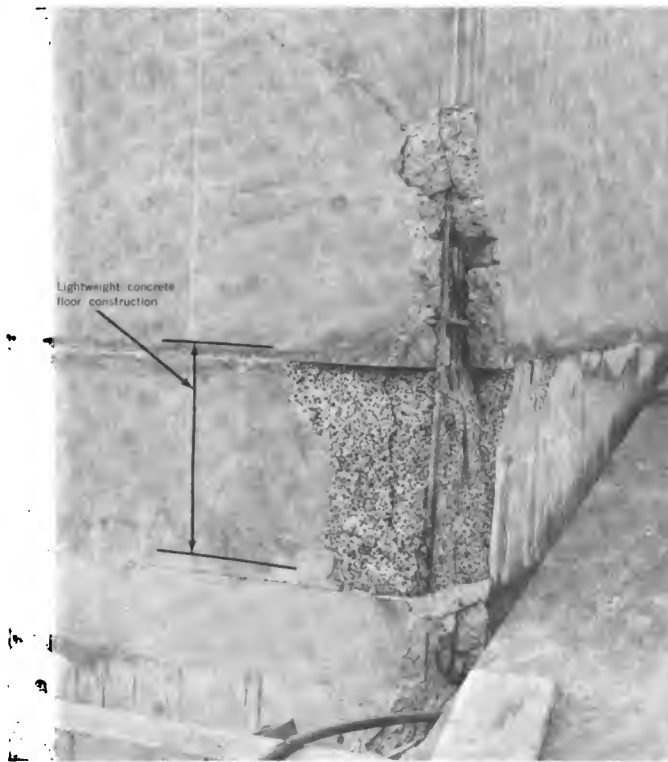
Museum for Antique Cars. Exterior northeast corner of museum building at first floor. Note lightweight concrete from slab extending through wall.
